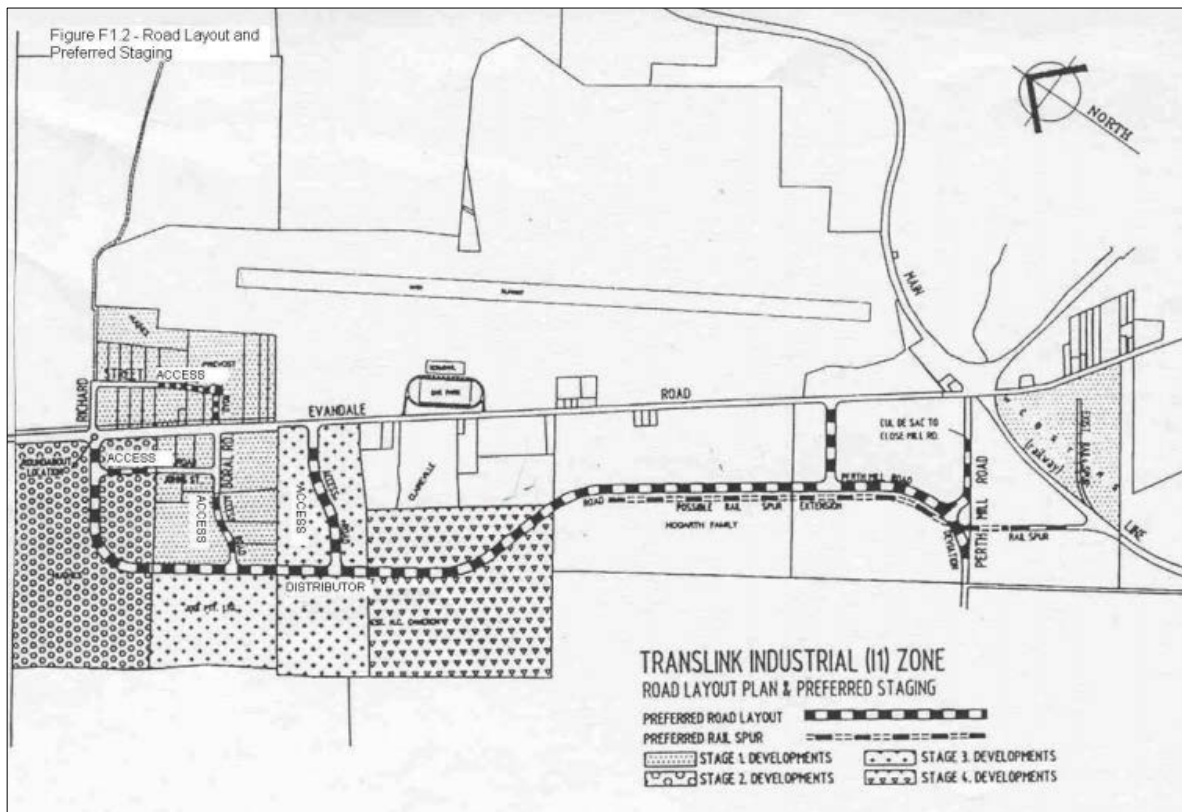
Road layout plan as required by clause NOR-S1.8.1
